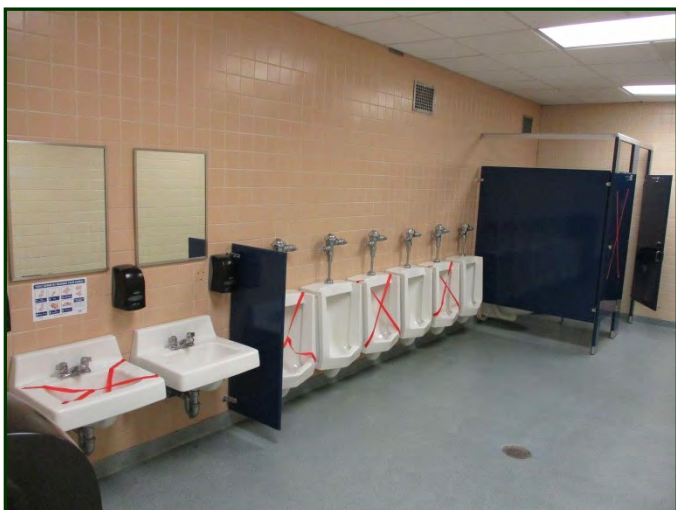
Boy's Toilet Room with epoxy flooring, ceramic tile walls and suspended acoustical ceiling system. Note periodic toilets blocked for Covid-19 precautions.
